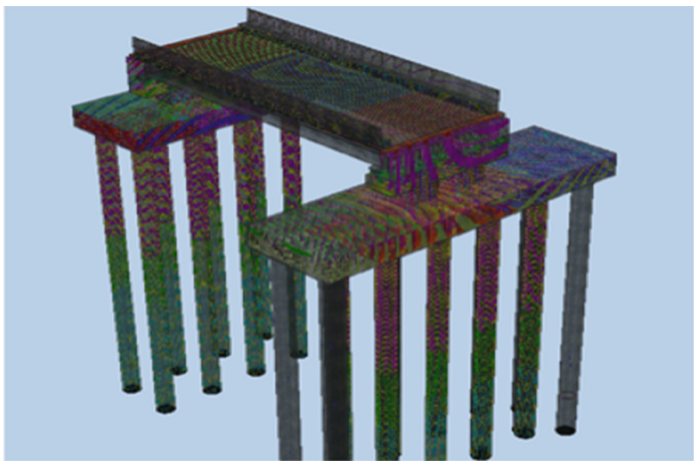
Isometric Projection of Bridge Model and Reinforcement
